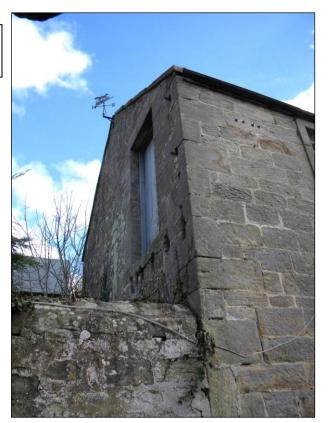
Rear (north east) elevation of stables adjoining land not in the ownership of the client.
